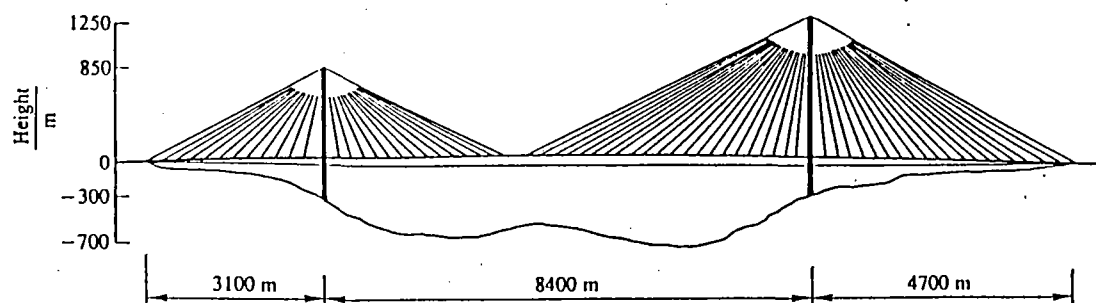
Proposal for a CFRP bridge across the Strait of Gibraltar at its narrowest site; since tower foundations deeper than 350 m are not possible, a maximum span of about 8400 m is necessary.
